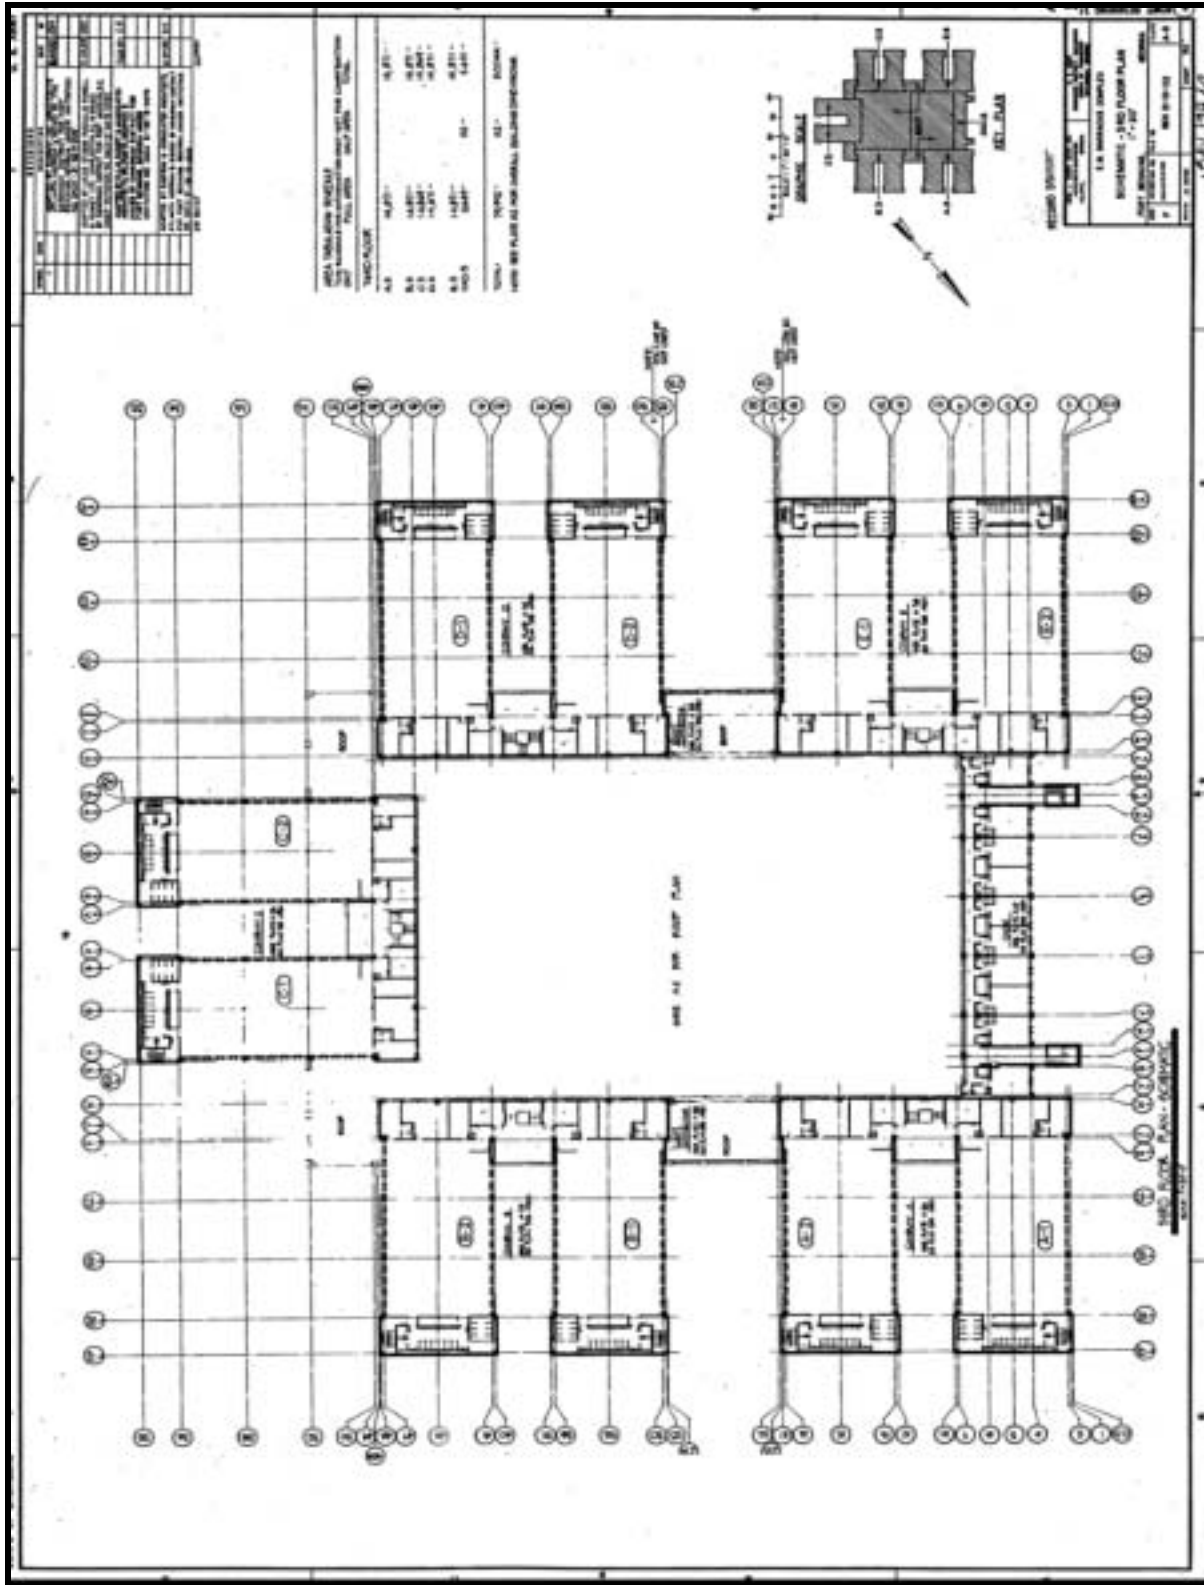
Starship barracks, third floor plan (ca. 1974, revised 1985) (Engineering, Ft. Benning).
